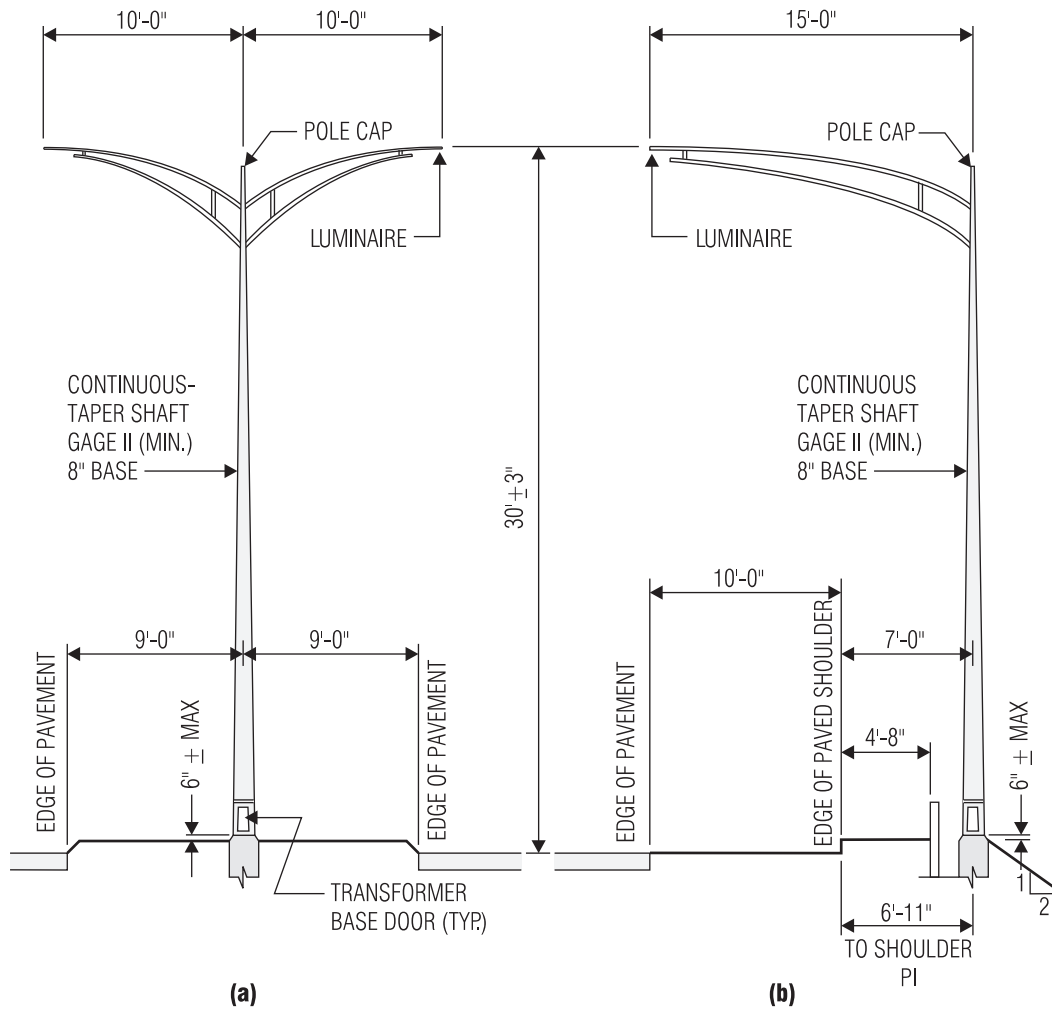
Highway lighting installation with luminaires mounted on tall posts.
